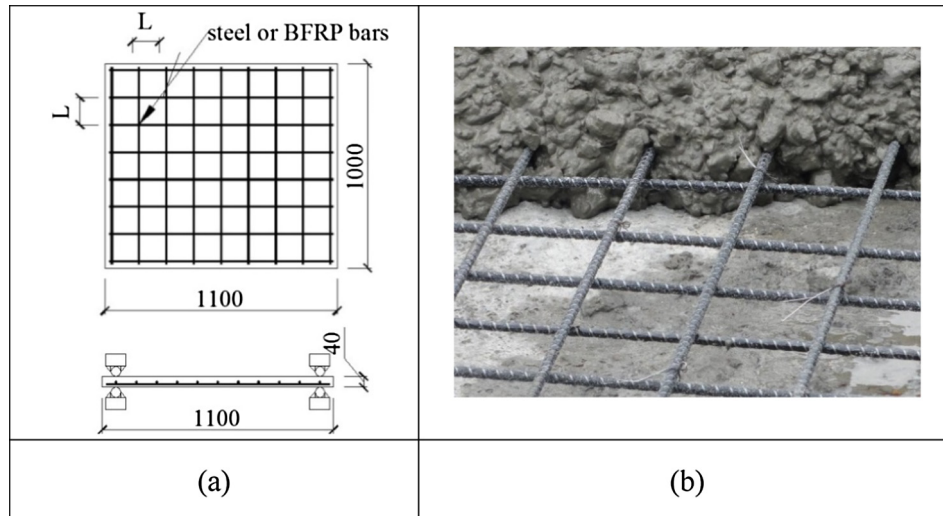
(a) Geometry of the slab reinforced by steel or BFRP bars and (b) casting BFRP reinforced concrete slab.
